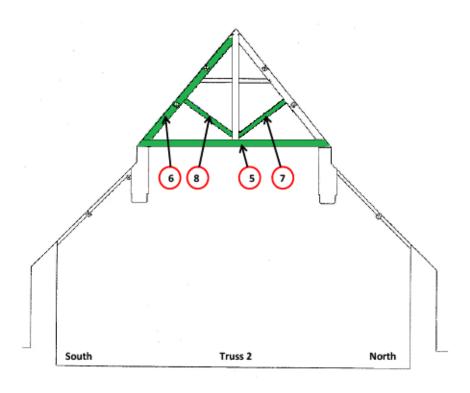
/b: Cross sections of the trusses to show sampled timbers (after Nick Hill)
